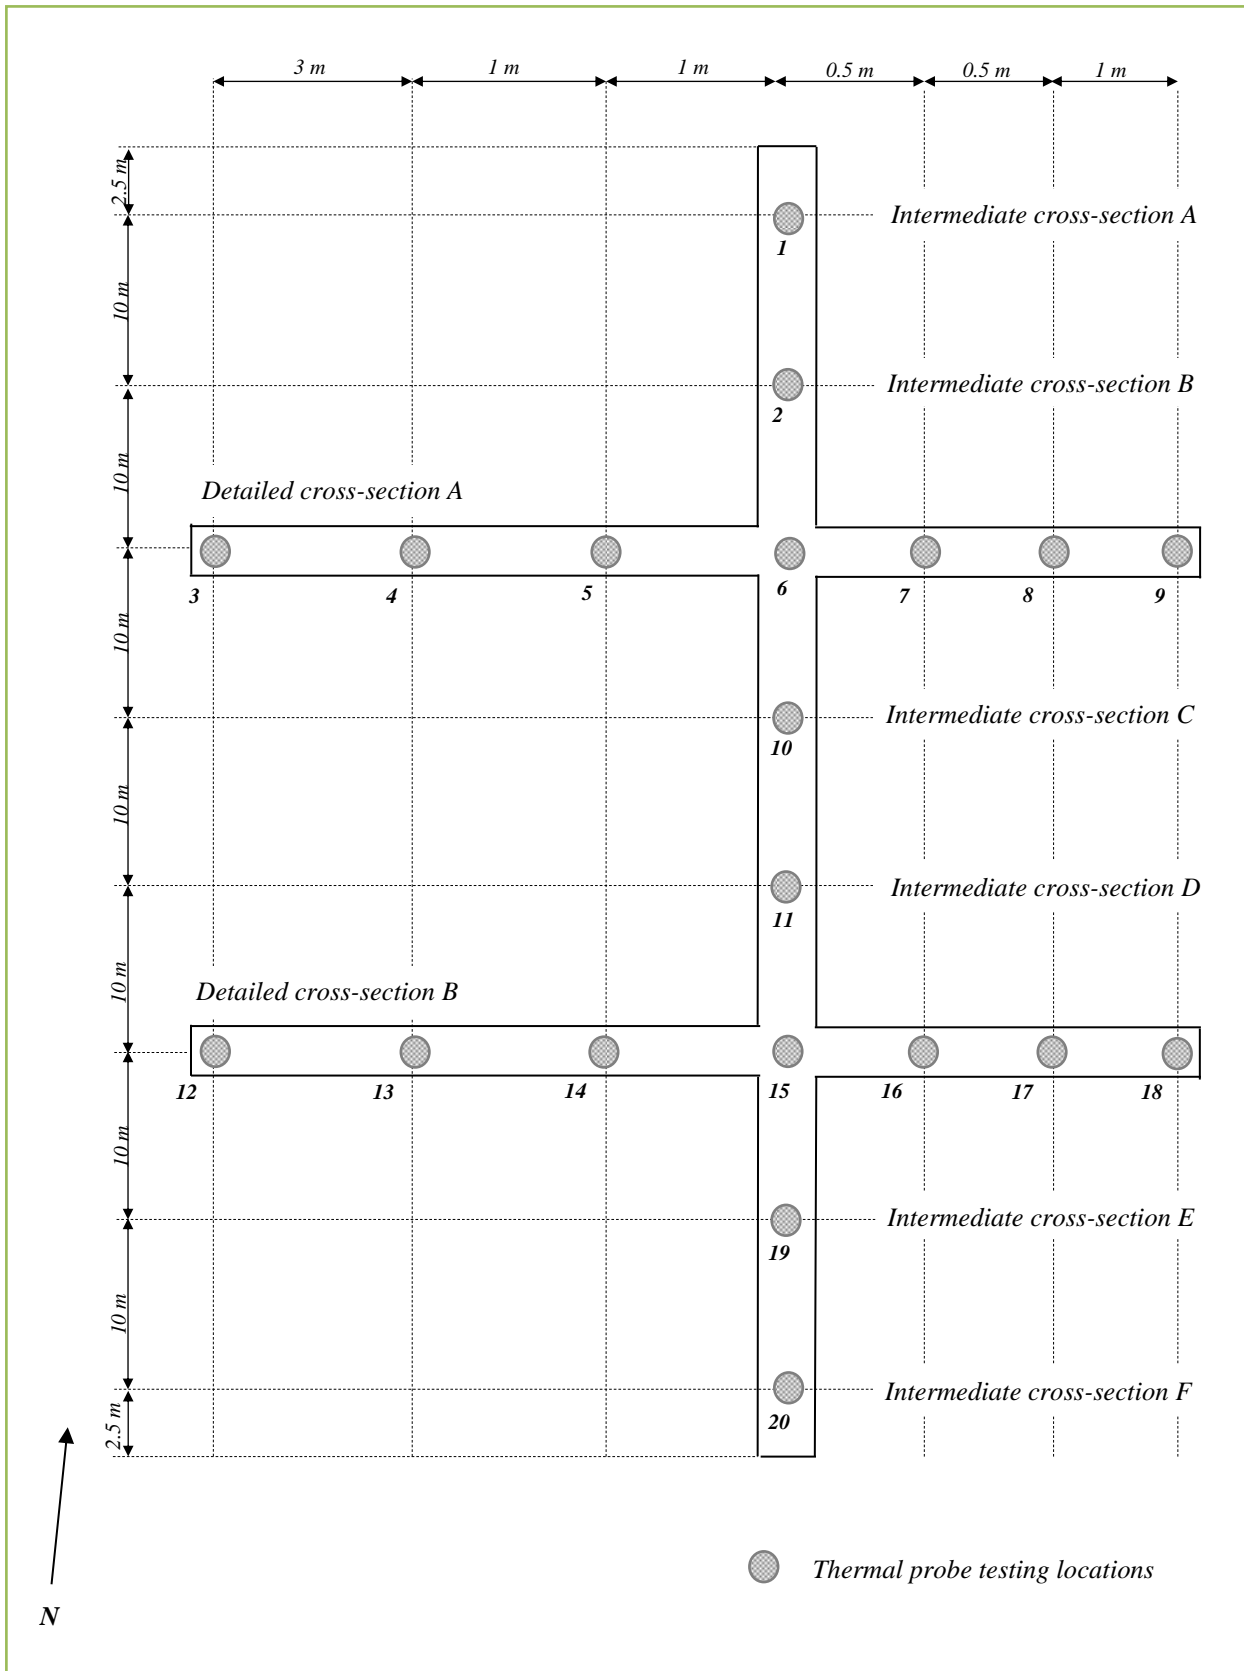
Plan arrangement for the thermal probe testing locations.
